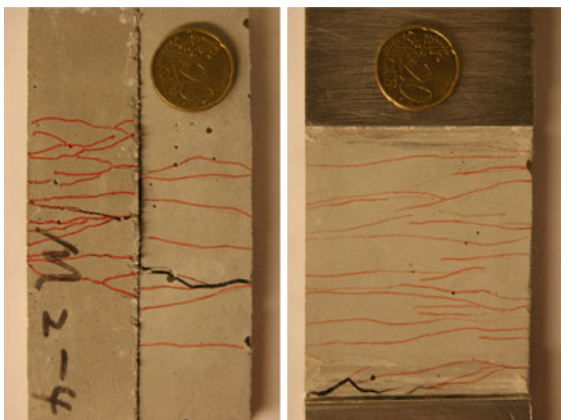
Multiple cracking of the specimens under four-point bending load (*left*) or uniaxial tensile load (*right*)
